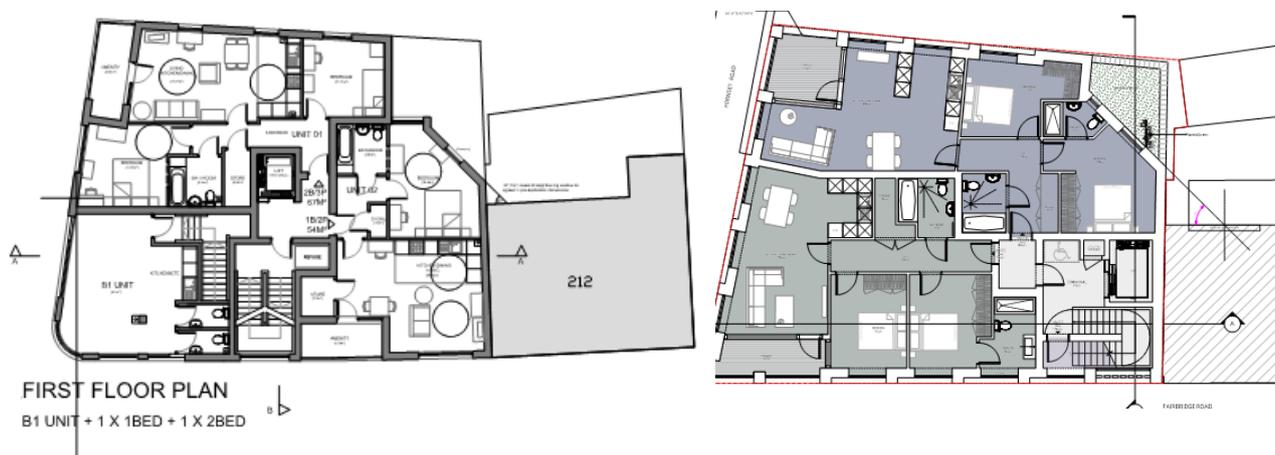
proposed first floor of P2015/1885/OUT and P2016/4928/FUL
